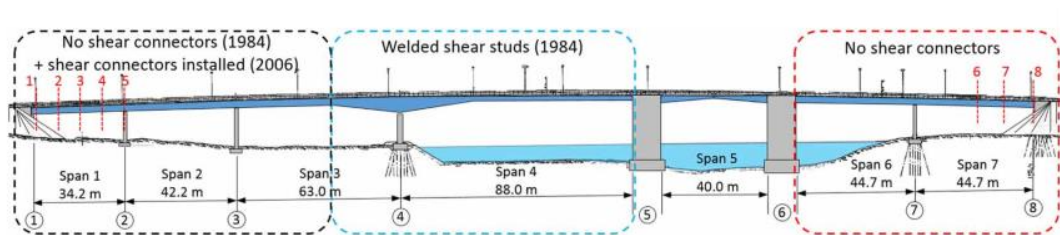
Elevation drawing of the Pitsund Bridge illustrating the different types of shear connection
